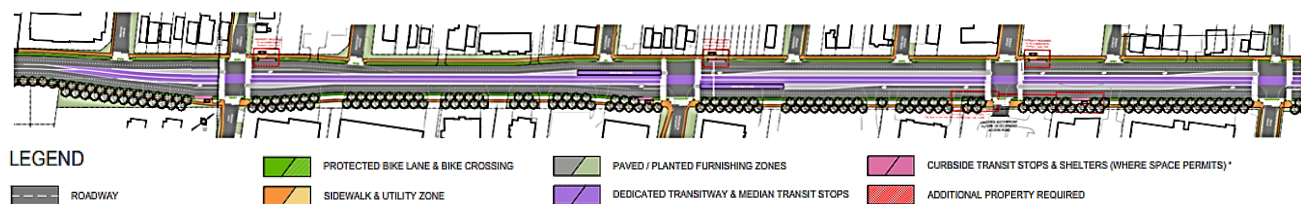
LAKESHORE ROAD EAST – ROLL PLAN EXCERPT (LAKESHORE CONNECTING COMMUNITIES TRANSPORTATION MASTER PLAN: CITY OF MISSISSAUGA / HDR)
